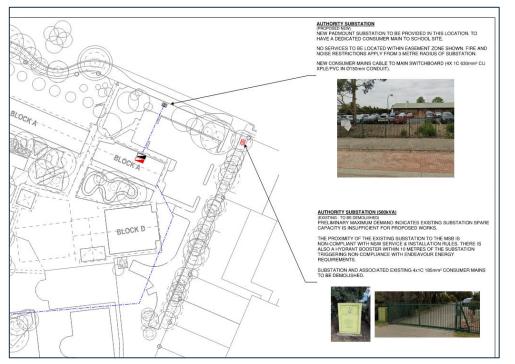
PROPOSED LOCATION FOR SUBSTATION
